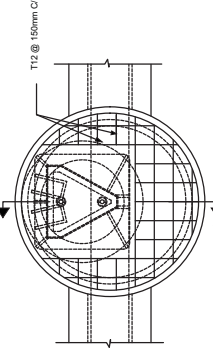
DETAILS OF PLASTIC FIBRE REINFORCED COVER FOR MANHOLES
